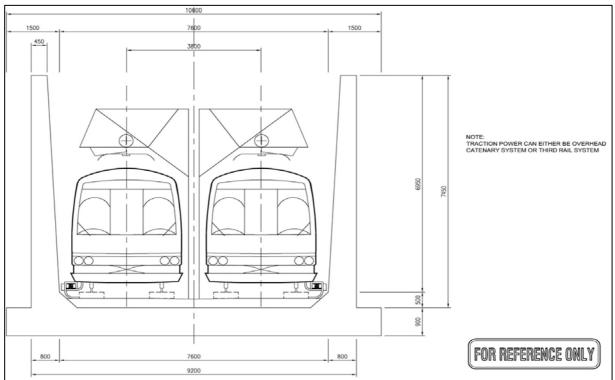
Typical Section of Cut & Cover at Tunnel Portal (Twin Track)
